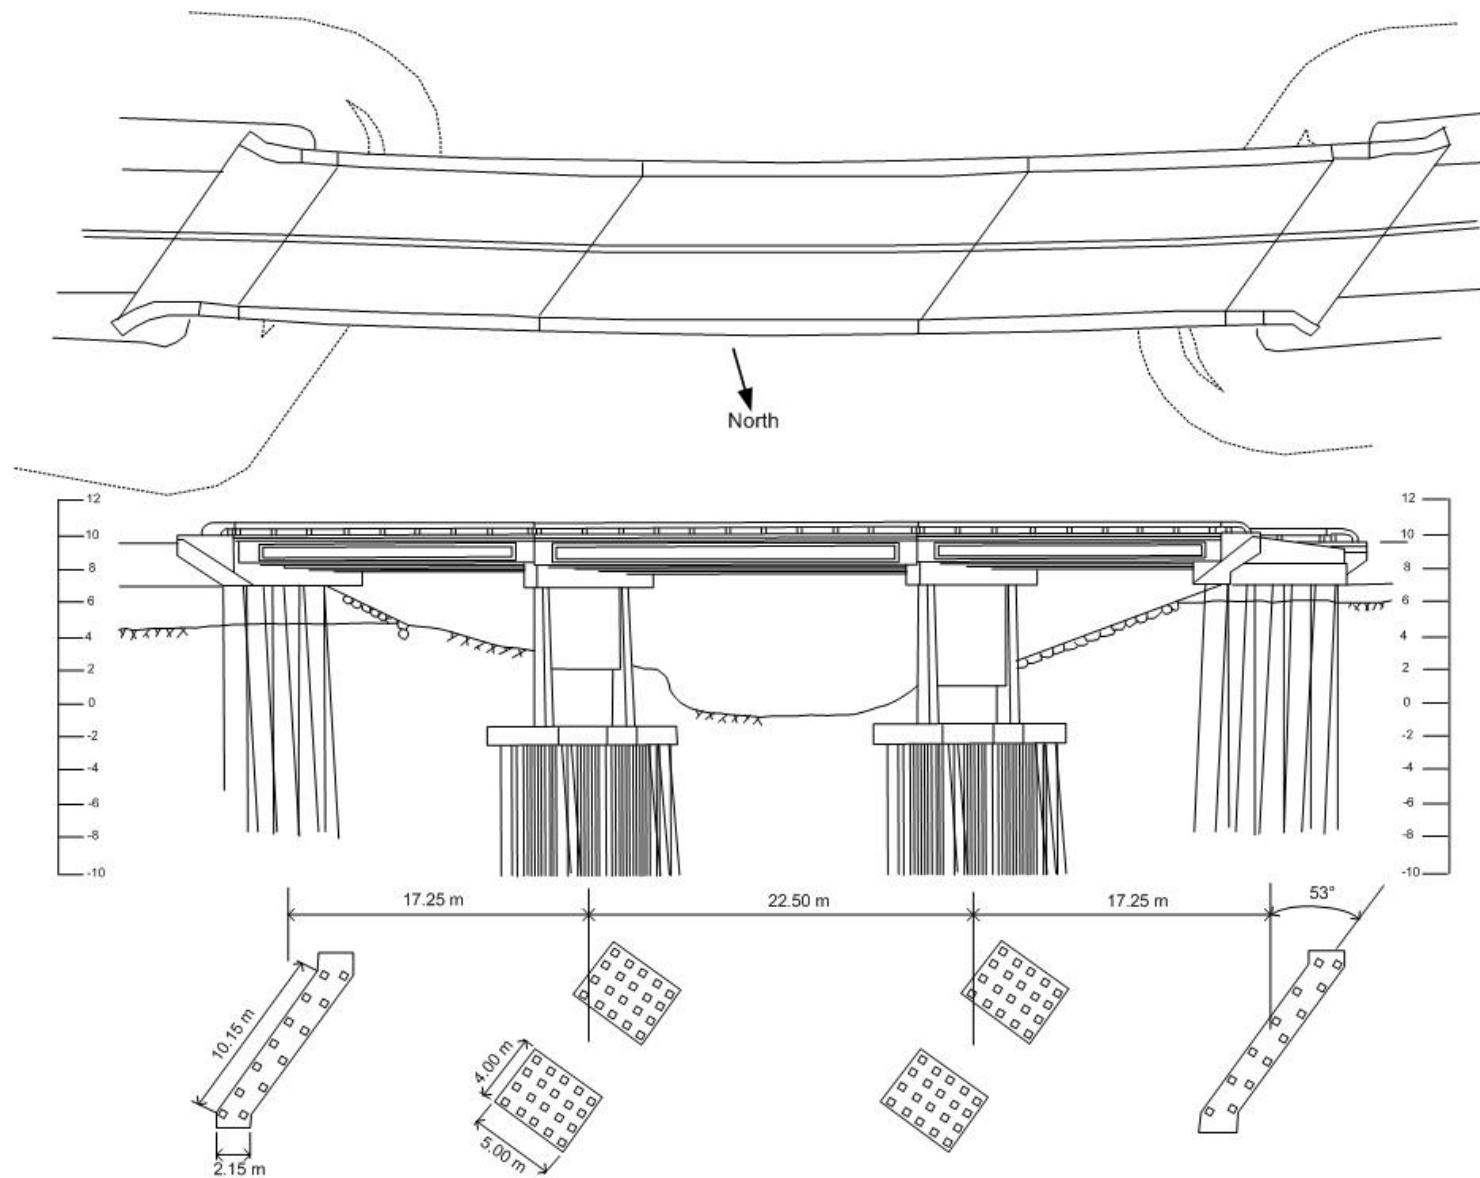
Simplified sketch of the plan and profile views of the Rio Blanco Bridge as shown on the bridge plans provided by the Costa Rica Ministry of Transportation
